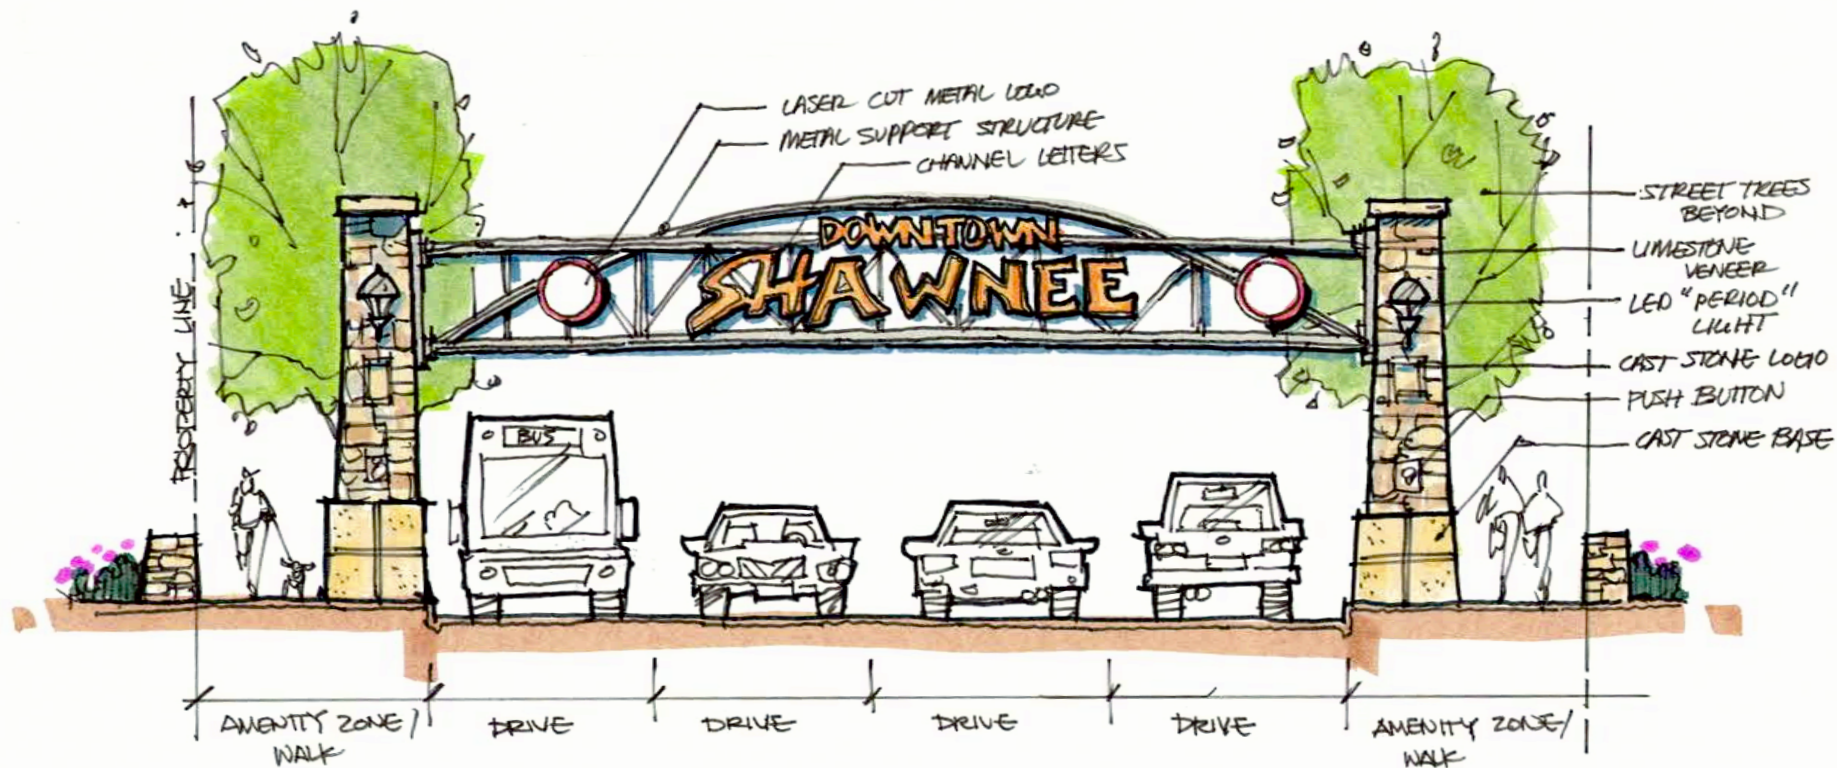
Primary Downtown Gateway Concept at Johnson Drive and Bluejacket Avenue
